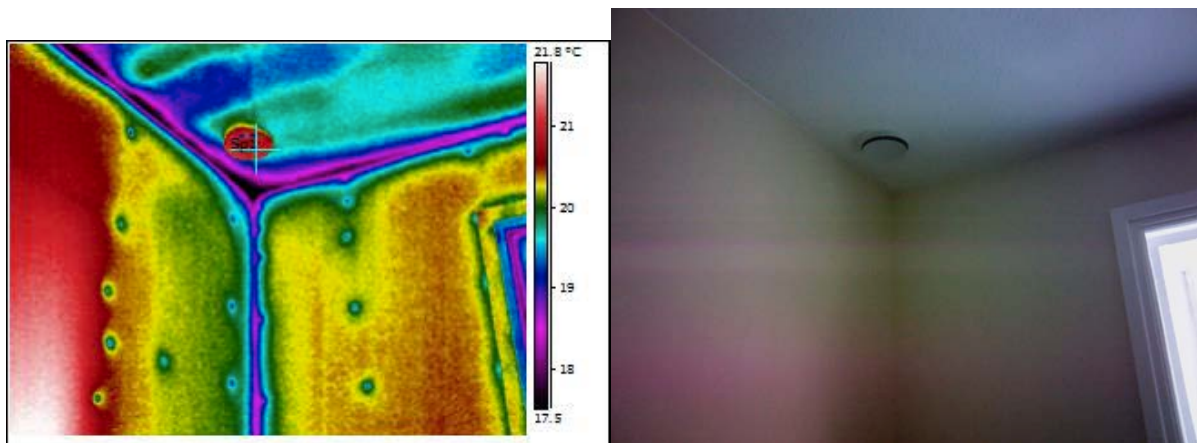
Room F10, First floor office. The red point shows the air outlet for MVHR system.
